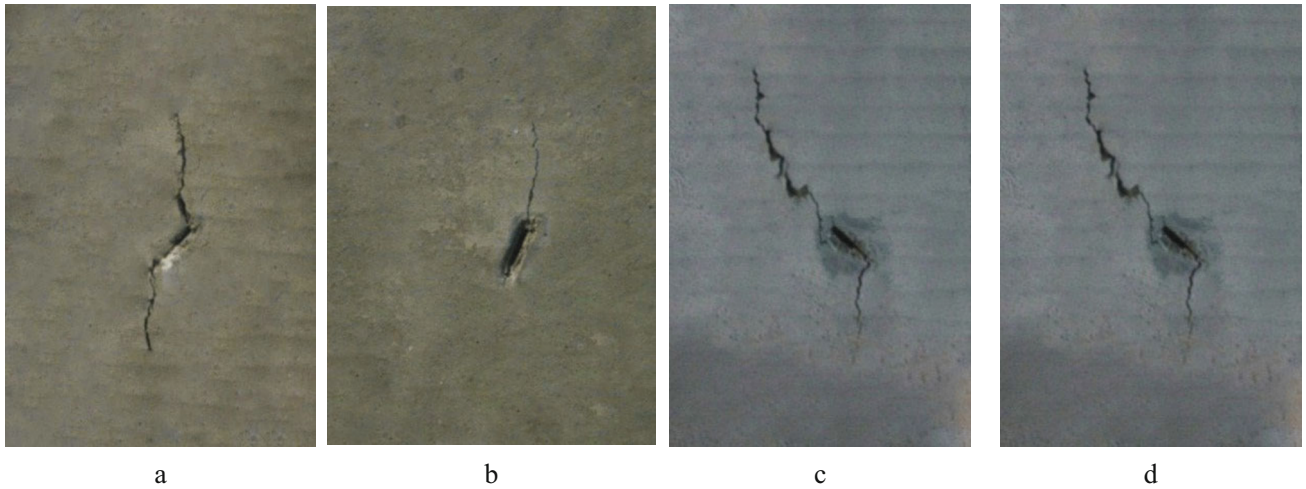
The failure and fracture patterns of cubic concrete specimens with a single centered crack at different inclination angles.
